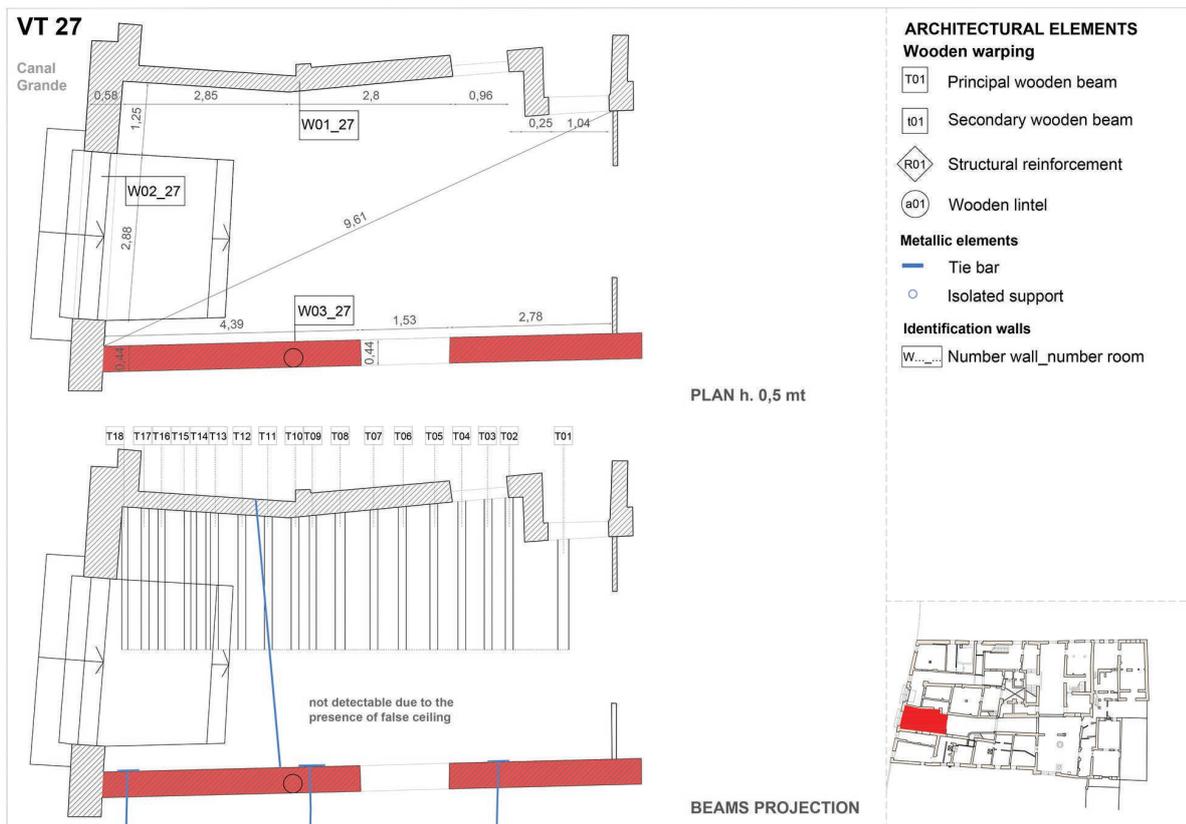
Palazzo Malipiero, Venice. Geometric survey of room 27 with the wall (W03_27) highlighted.
